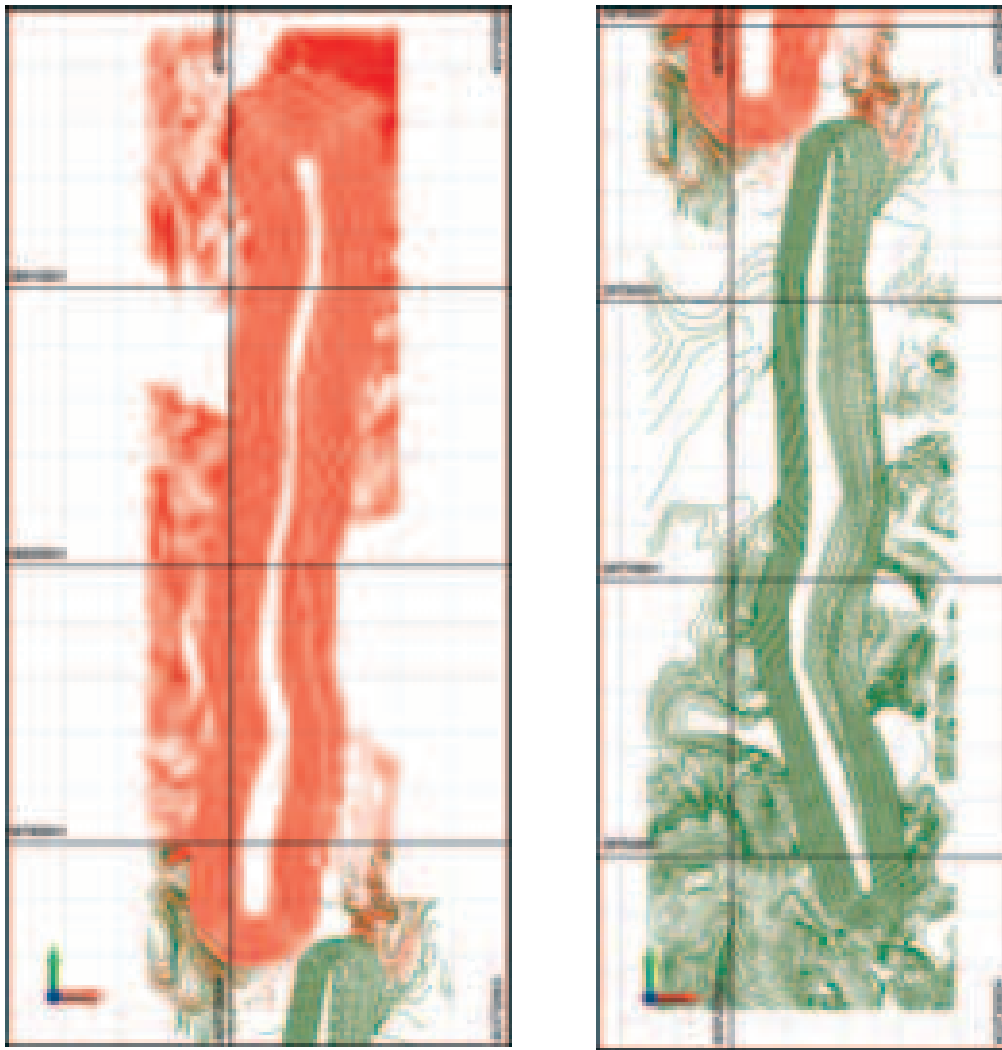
Plan views of pit design for north pit (left) and south pit (right)
